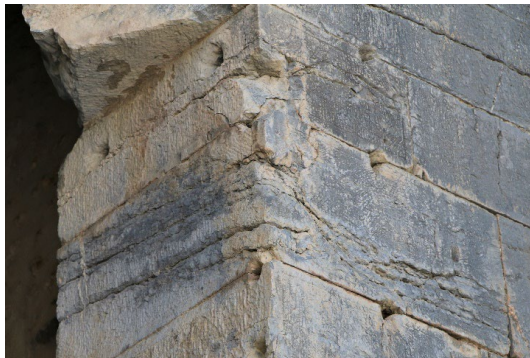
Cracks, ashlar masonry, cella entrance, Water Temple
